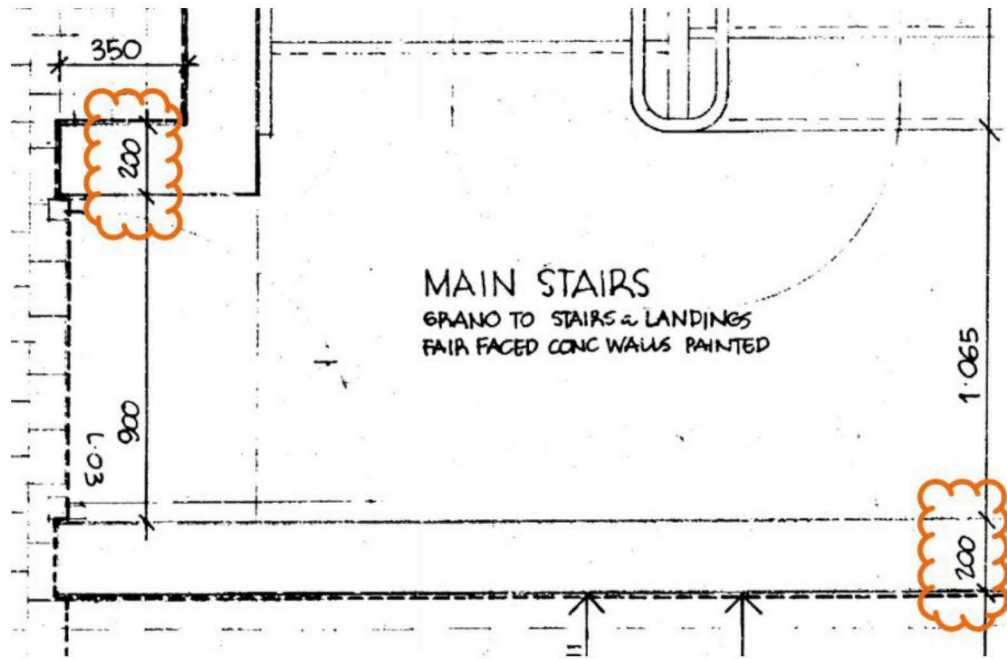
Original design drawings showing shaft construction of 200mm concrete (RBK00018858)
